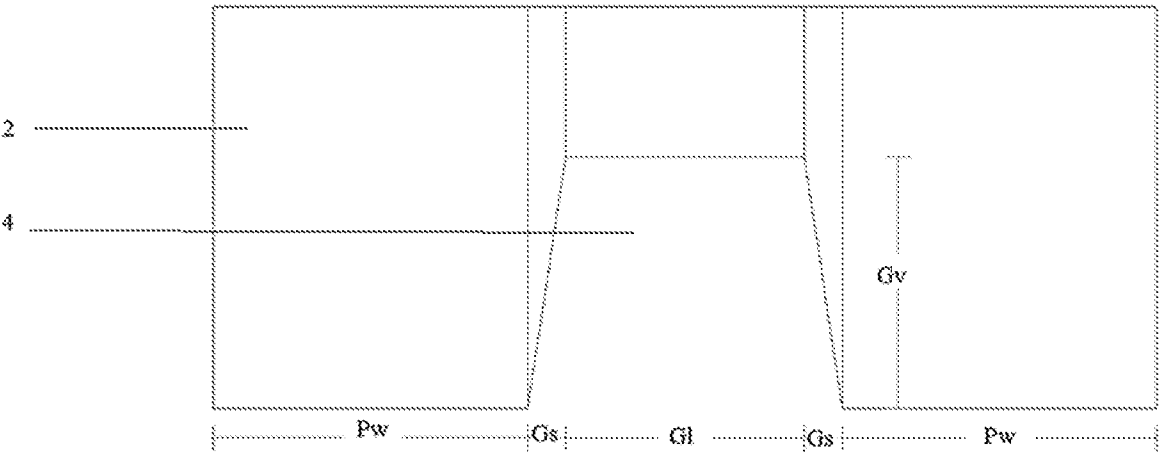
illustrates the detailed cross sectional view of tongue and groove joint
